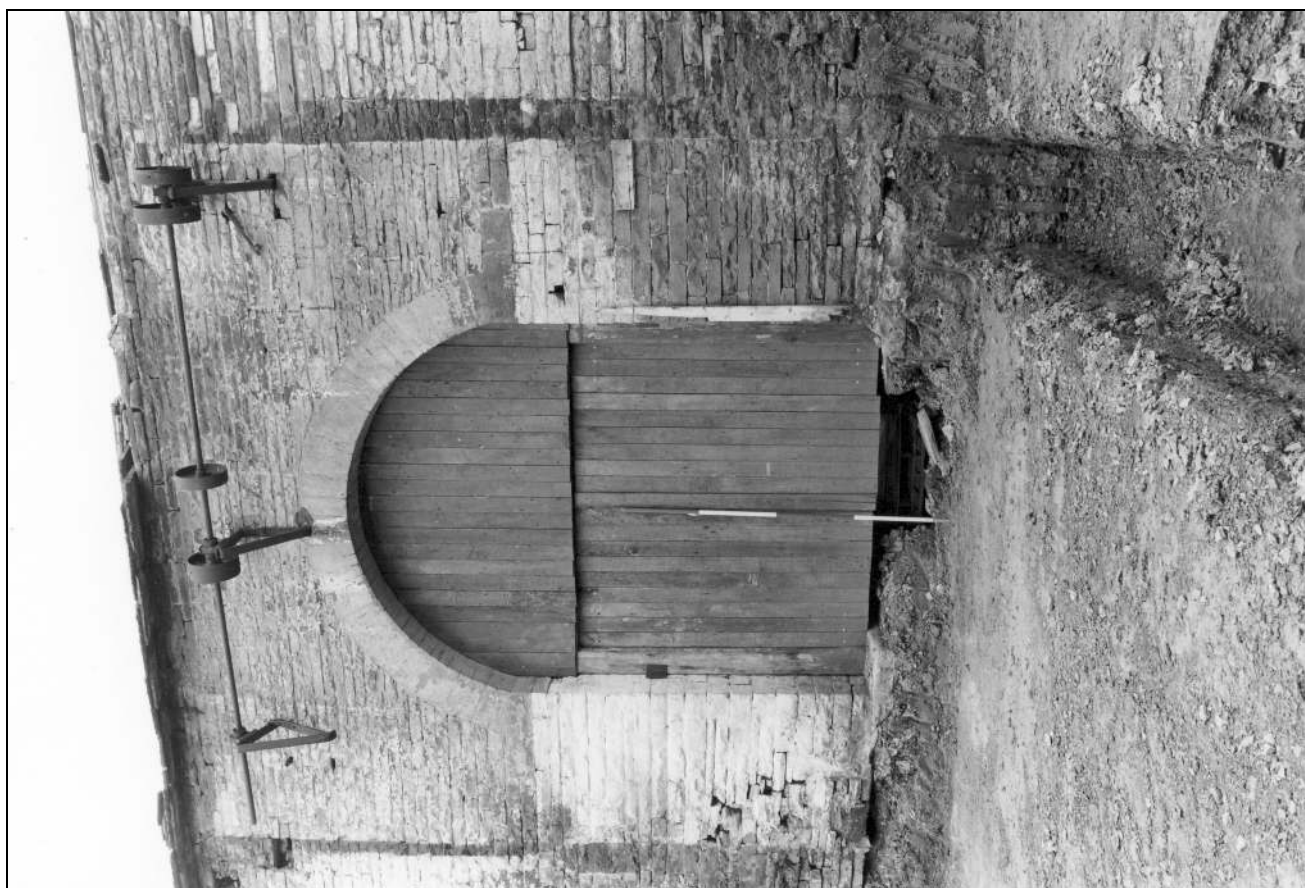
Arched doorway in east elevation, after demolition of lean-tos (film 8, frame 4)
